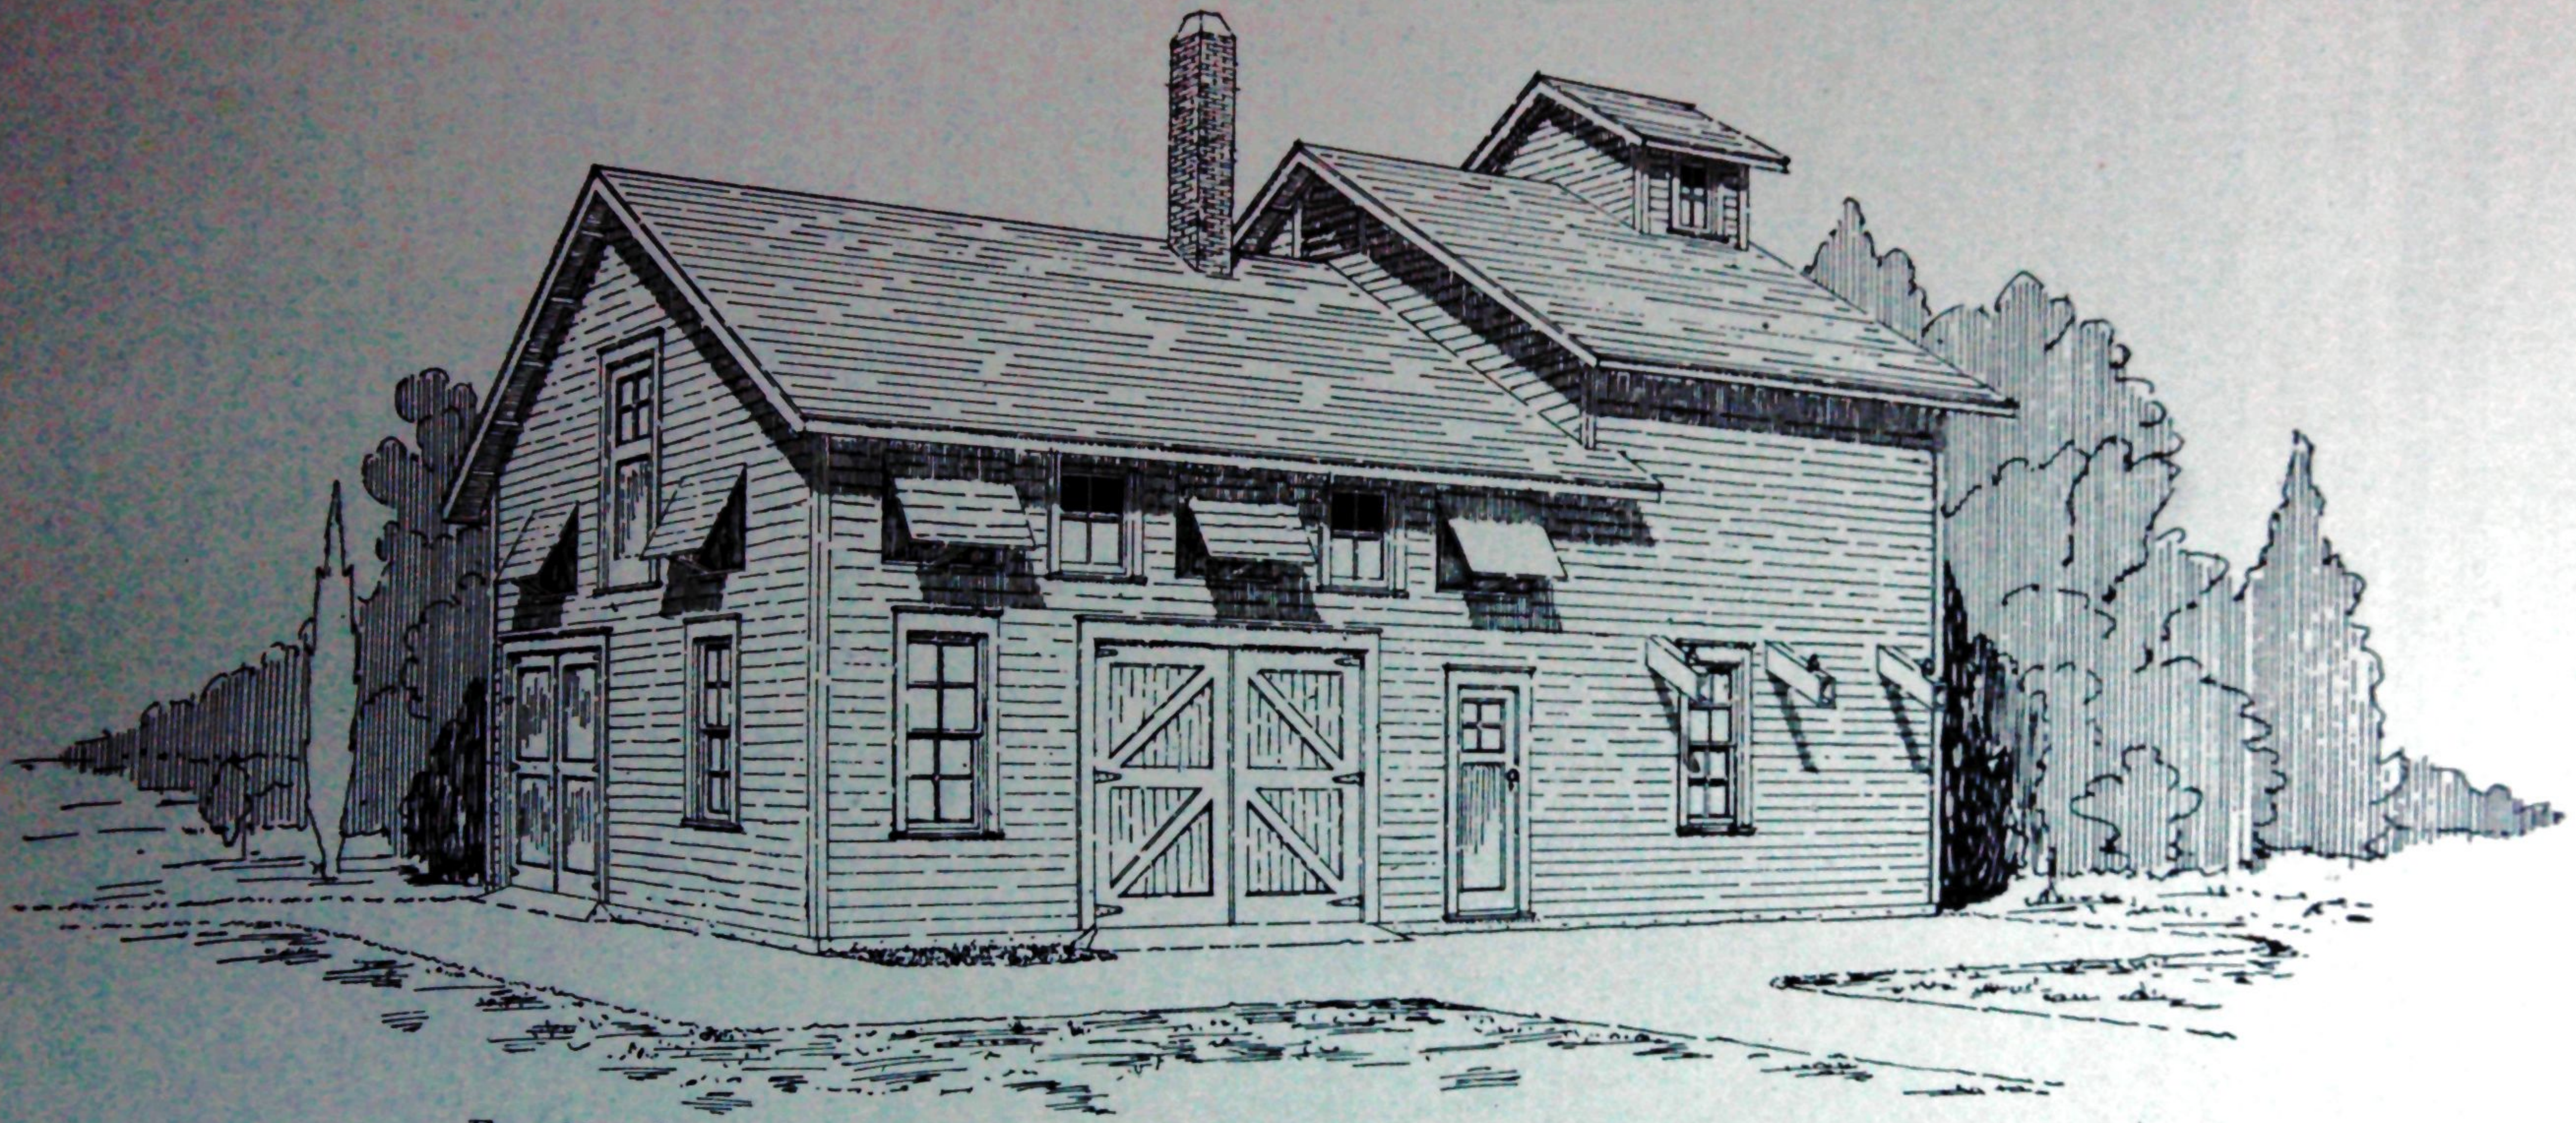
COMBINED GARAGE AND SEED-CORN HOUSE. WOODEN CONSTRUCTION
